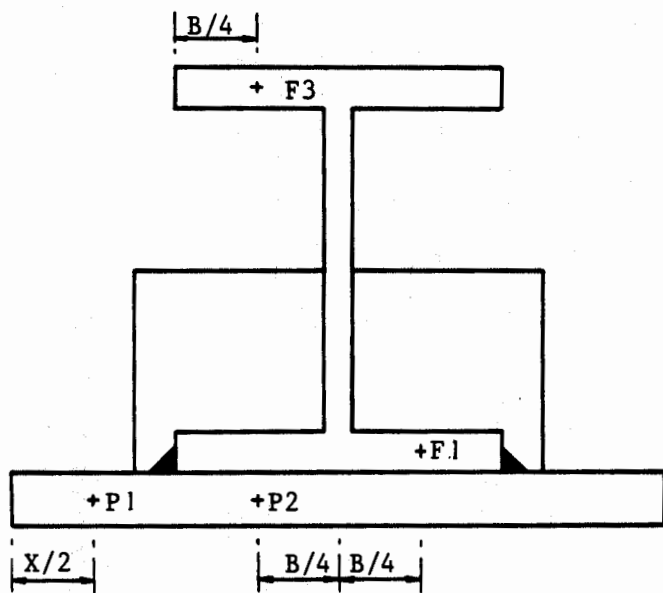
THERMOCOUPLE POSITIONS IN THE STEELWORK - LONGITUDINAL ARRANGEMENT (R4/38)
